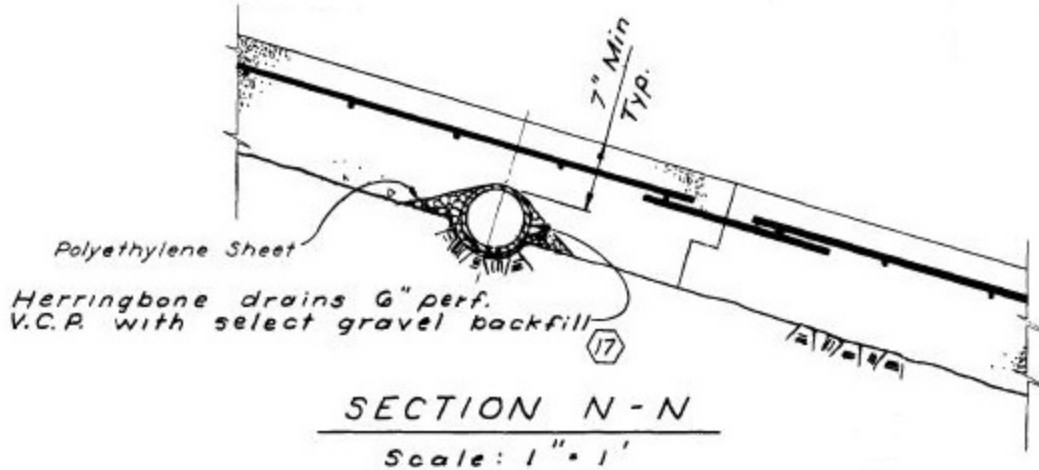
Oroville Dam Service Spillway Slab and Drain Detail
